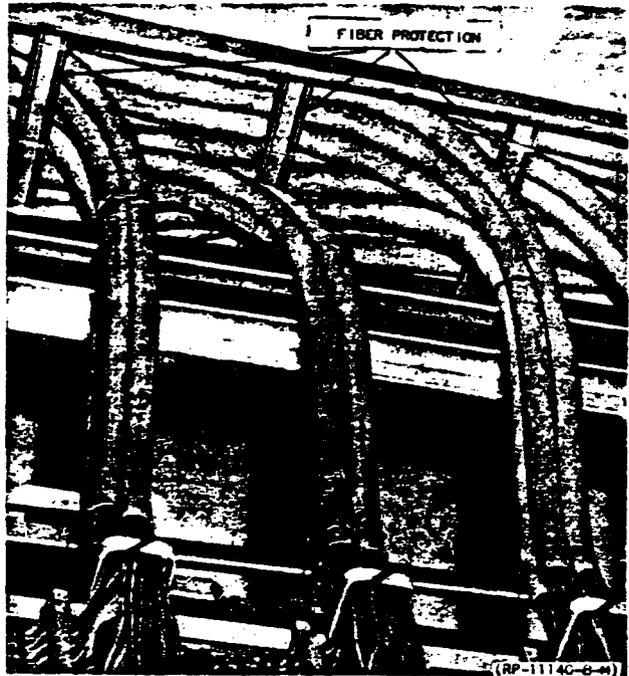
TURNING CABLES THROUGH CABLE RACKS (PAR. 3.411)
